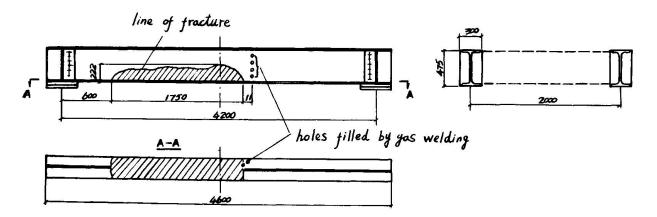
Sketch of the girder bridge No. 248 and its failure location
